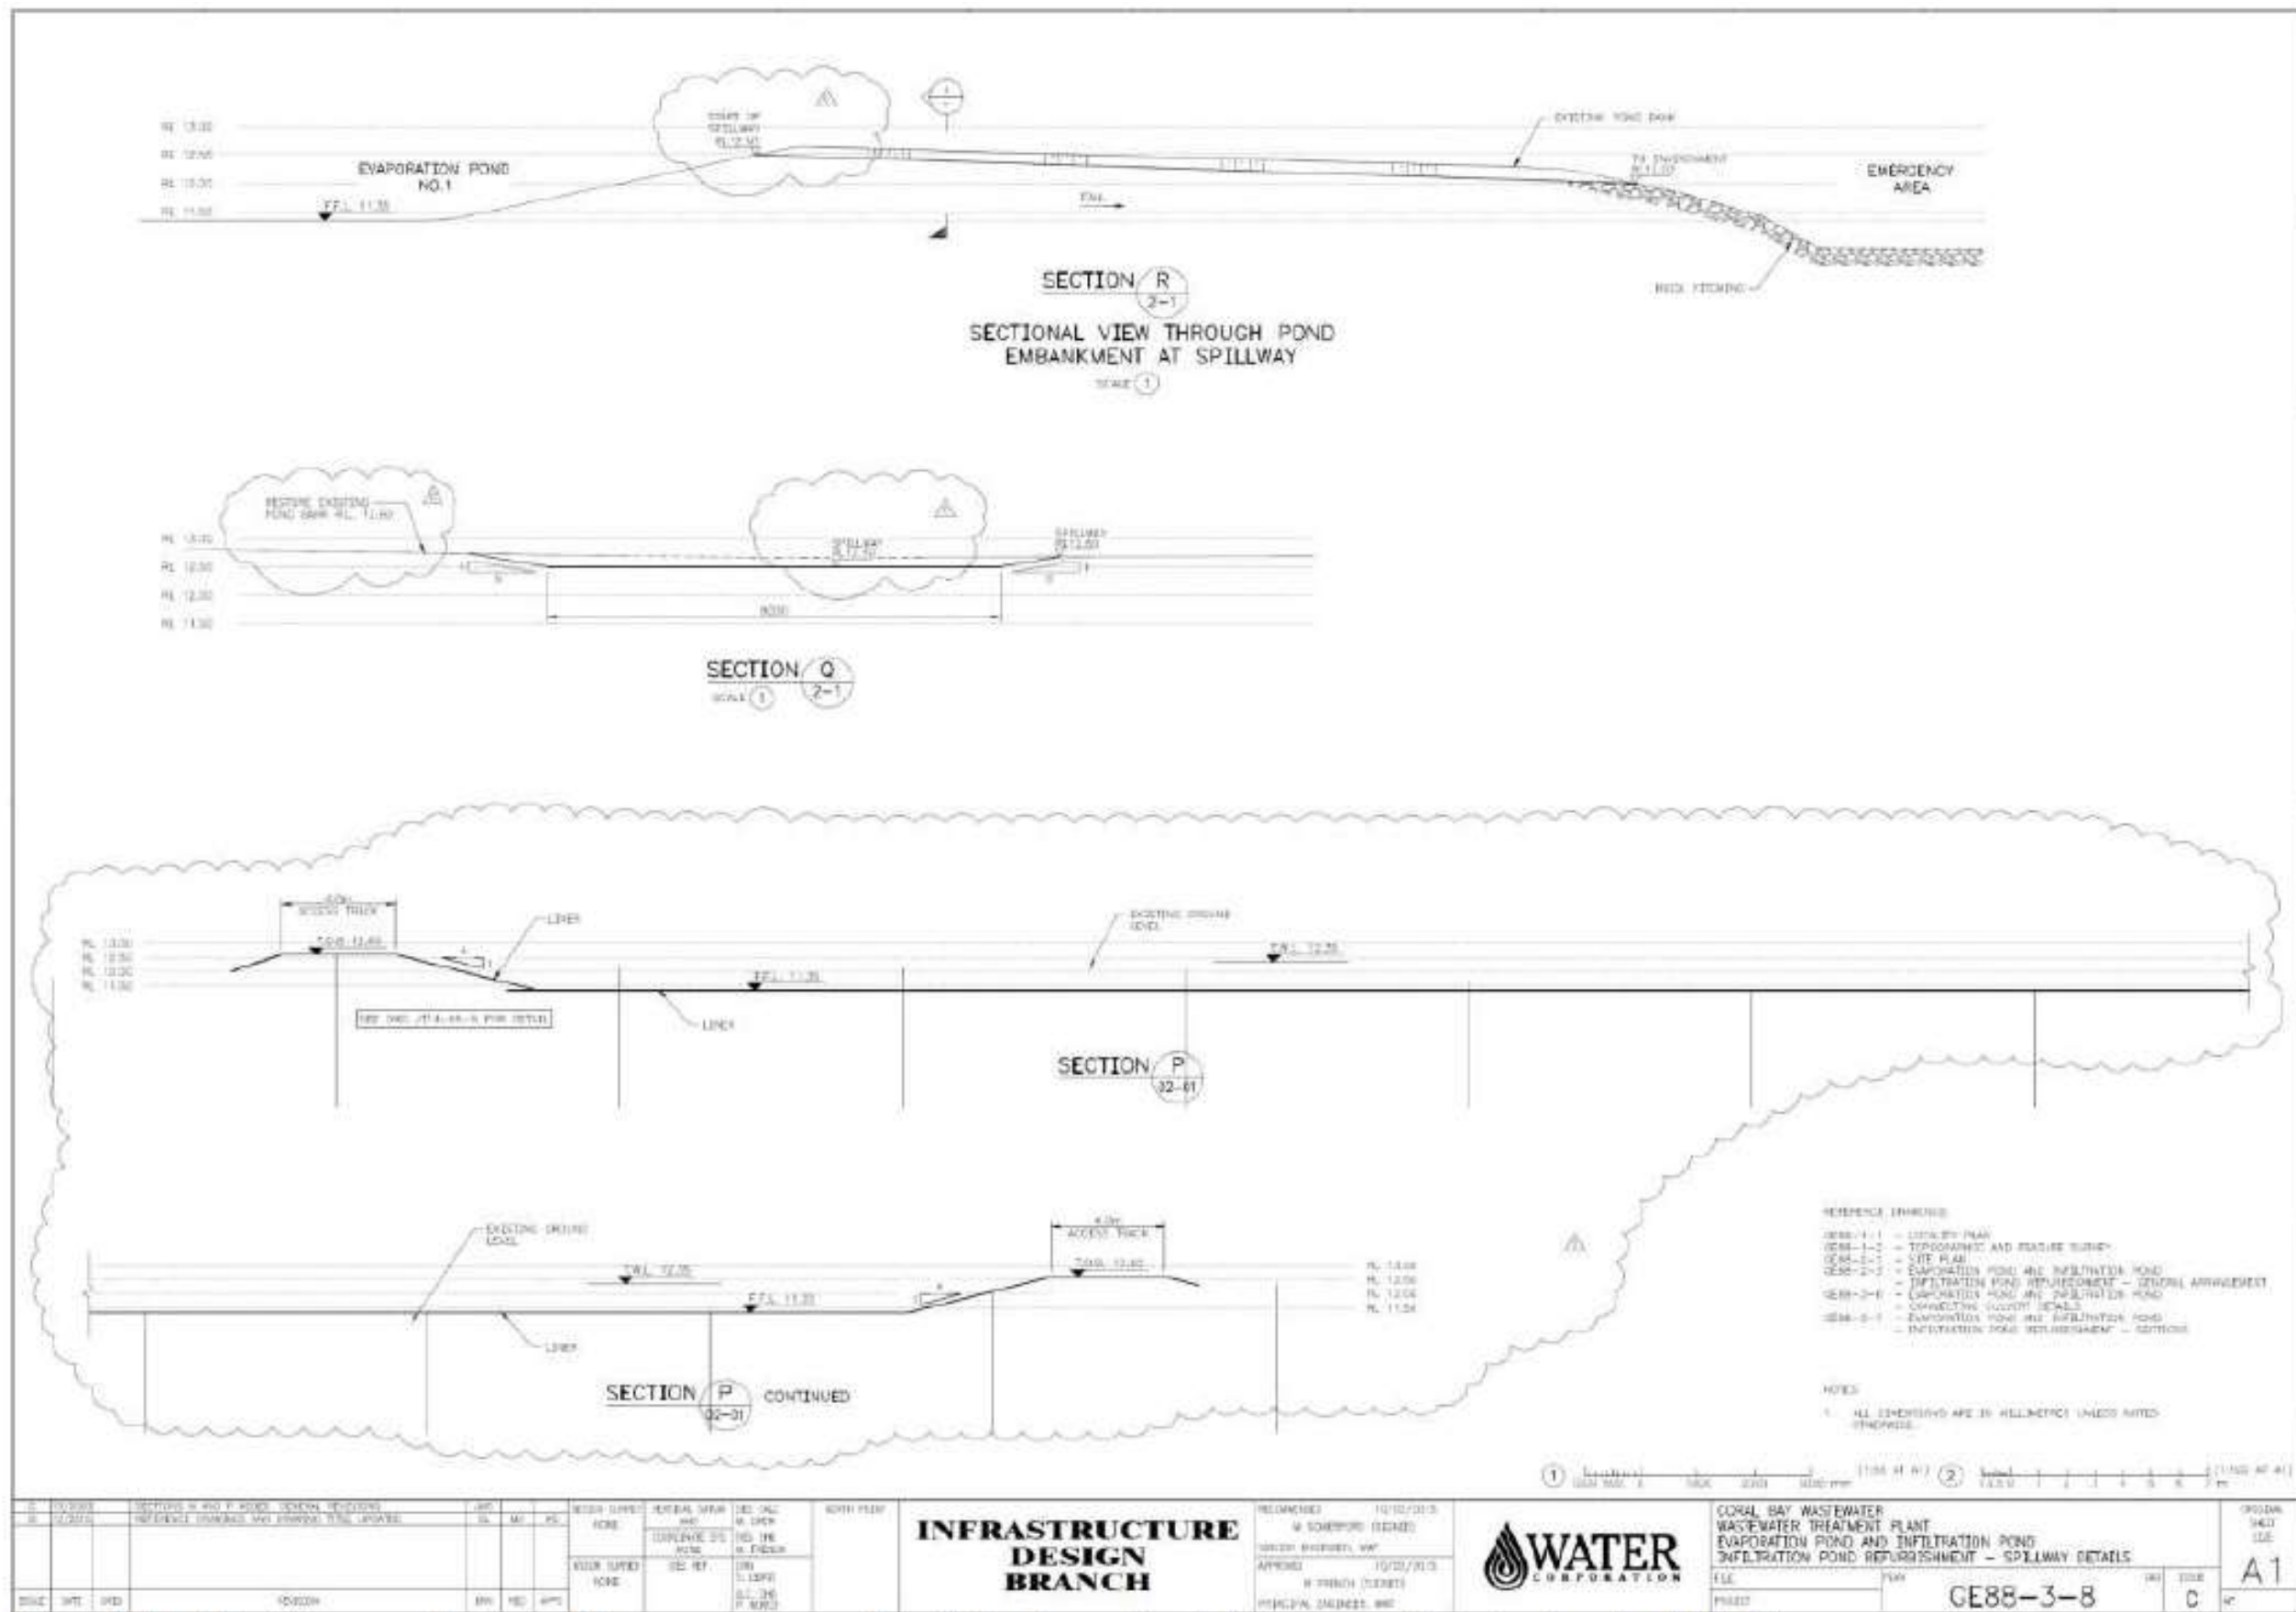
Coral Bay Wastewater Treatment Plant evaporation pond and infiltration pond refurbishment – spillway details – plan GE88-3-8
